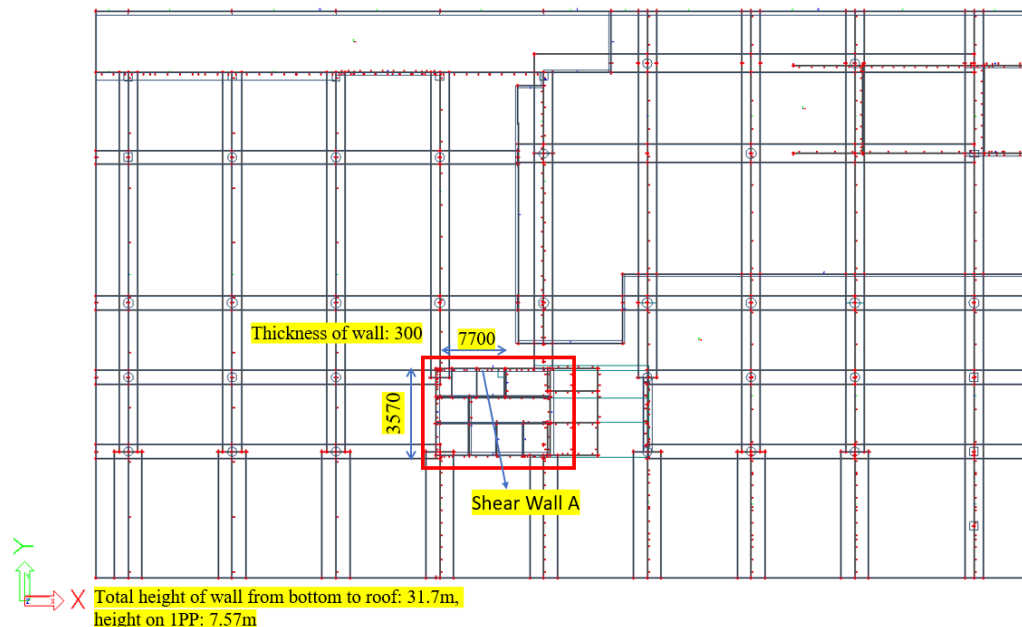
Layout of the 1PP showing the location of shear wall (core wall) near the staircase
